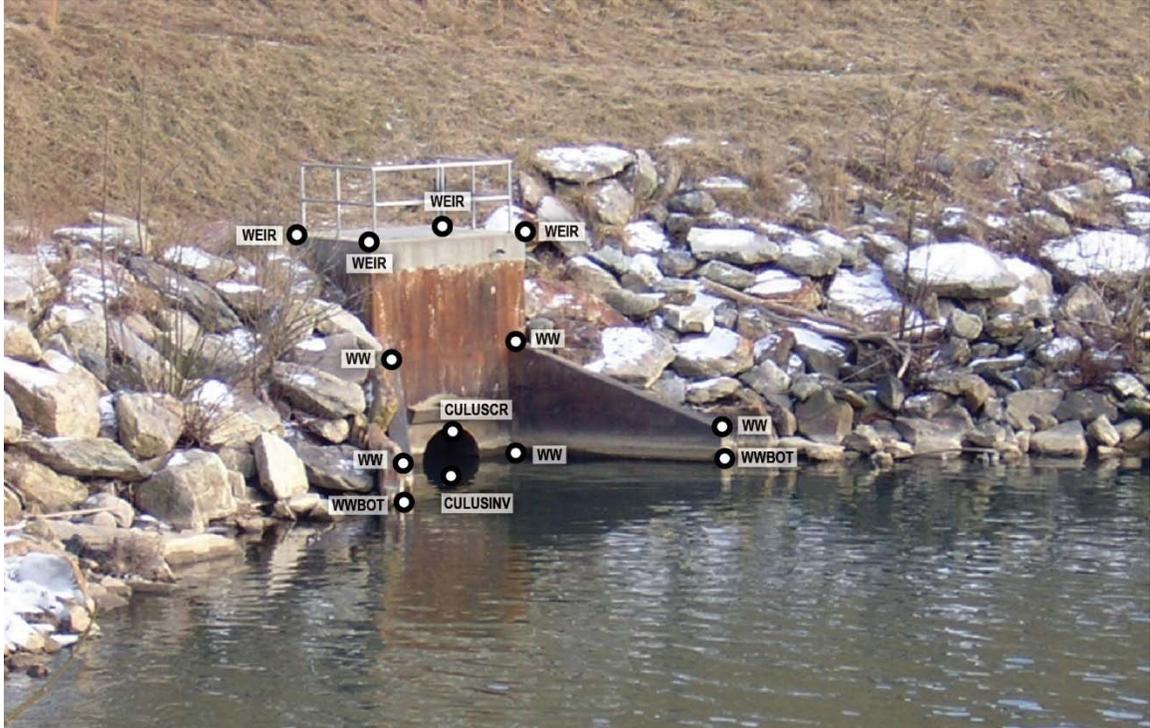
Typical Culvert Sketch: Sanderson Creek SAN-0880
